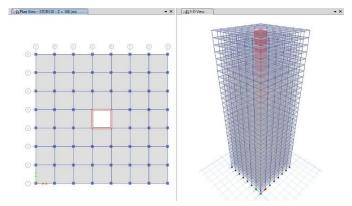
ETABS plan and 3D view of RCC and composite core wall system
